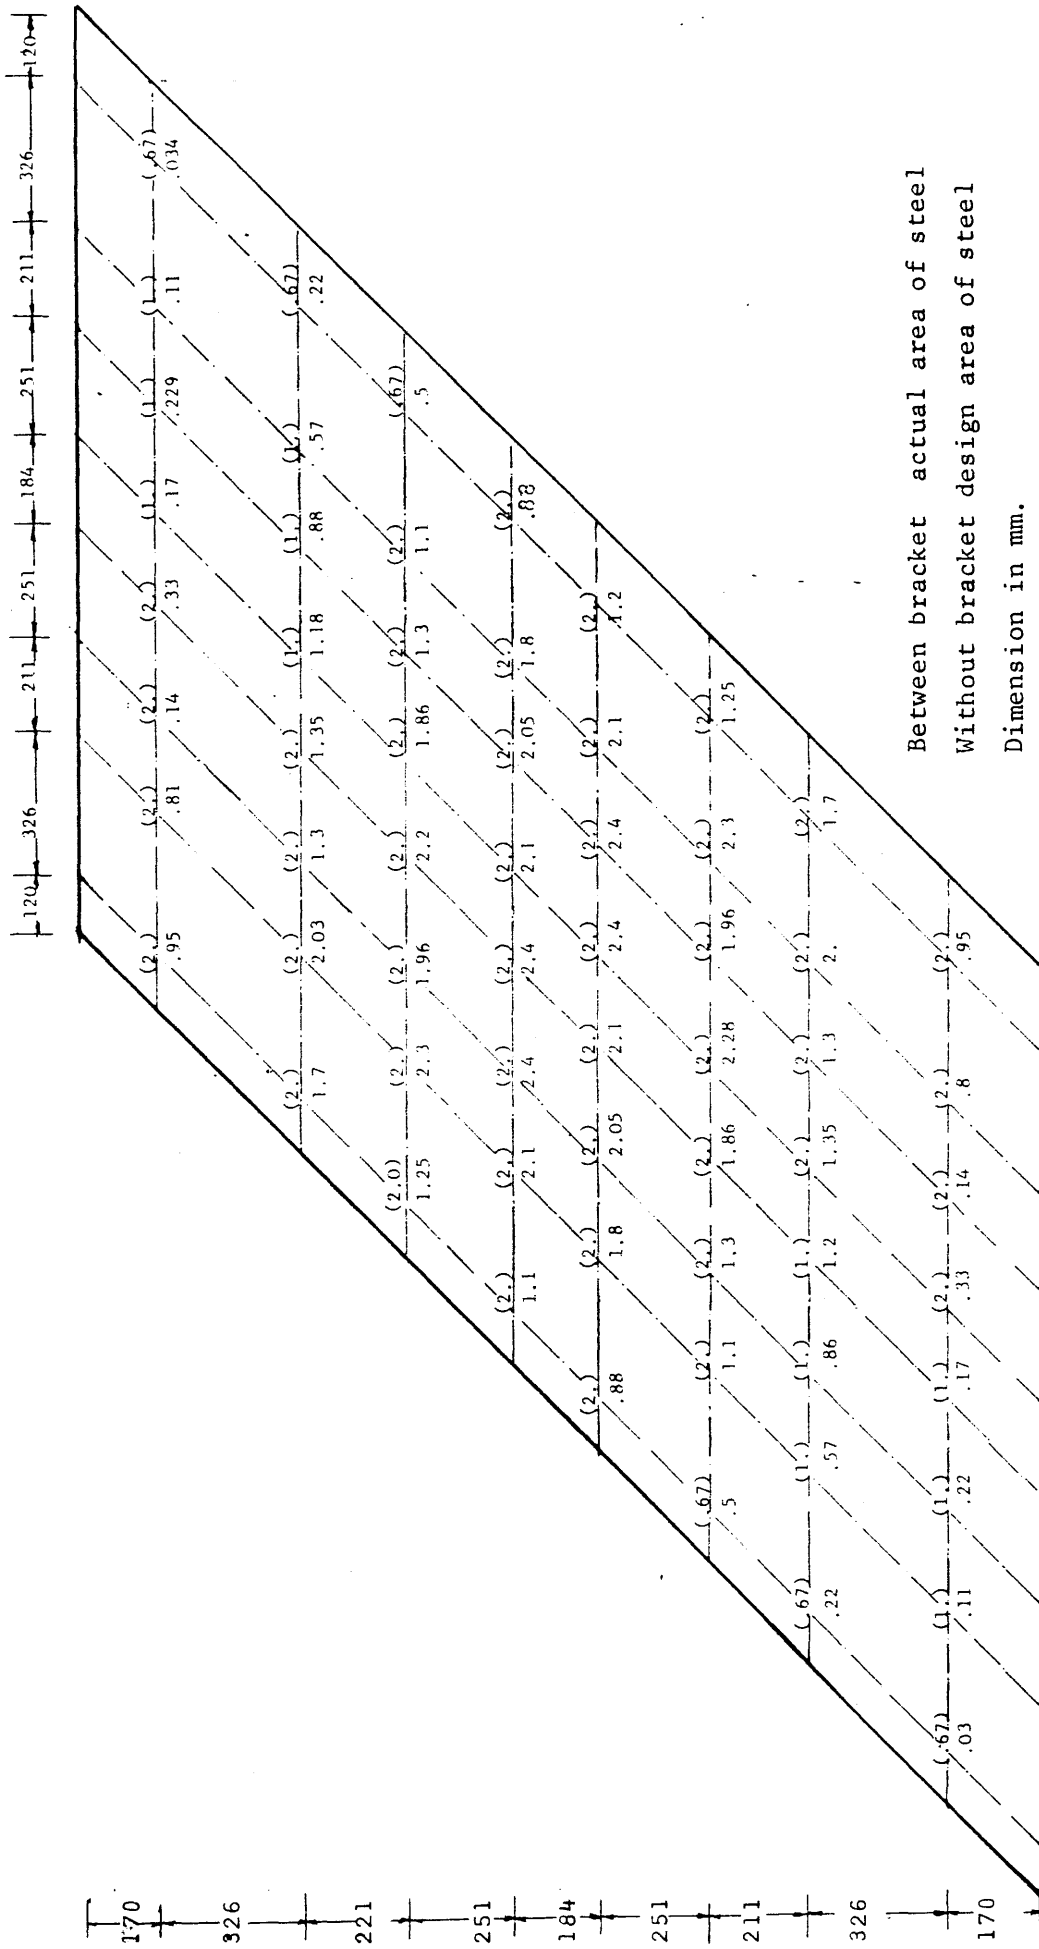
MODEL SKEW SLAB NO.(3) Bottom Longitudinal area of steel per unit width (mm²/mm)
